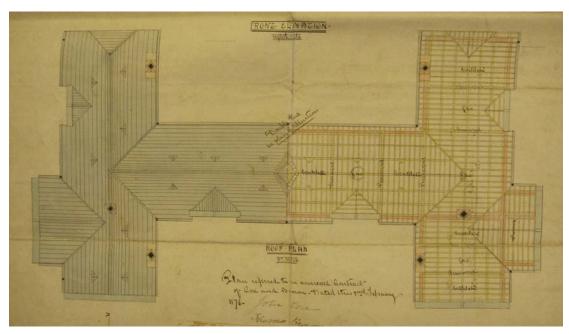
Original roof plan dated November 1875 (CRO(B) Z1041 1875-1904)
